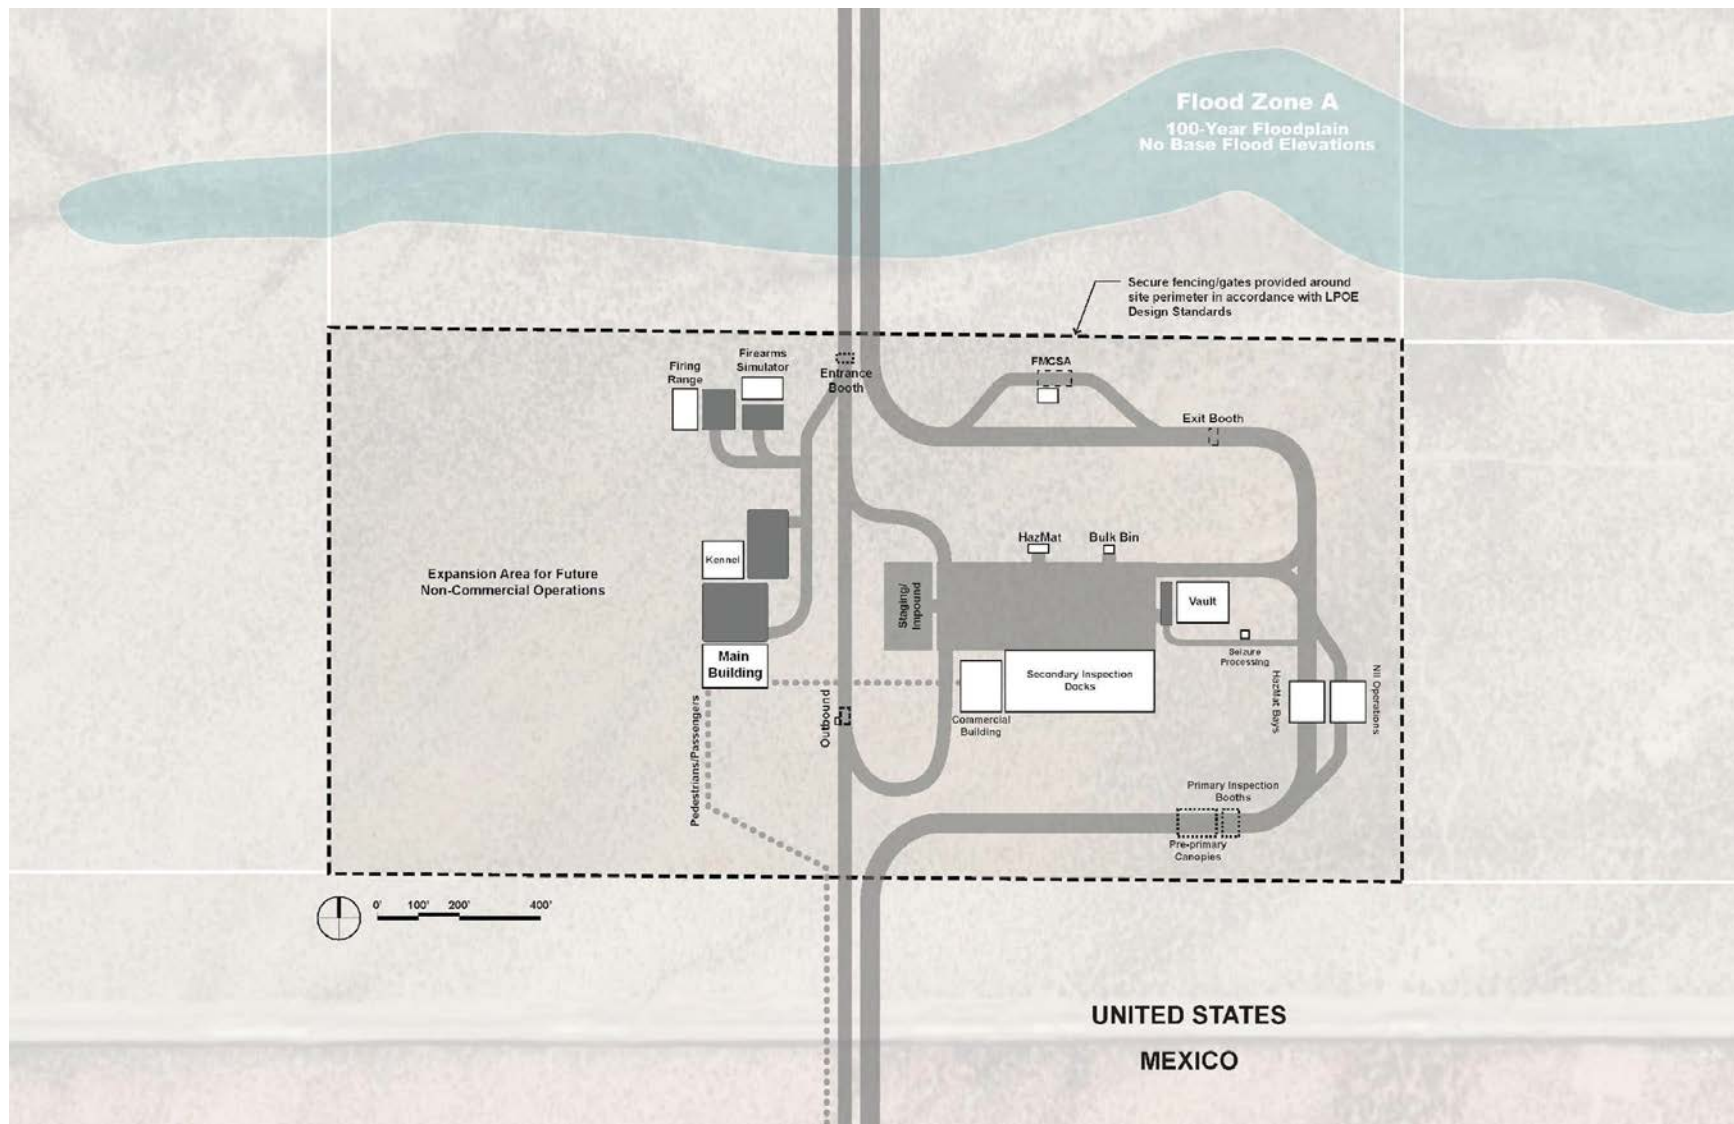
Conceptual Site Layout of the Proposed Commercial LPOE
